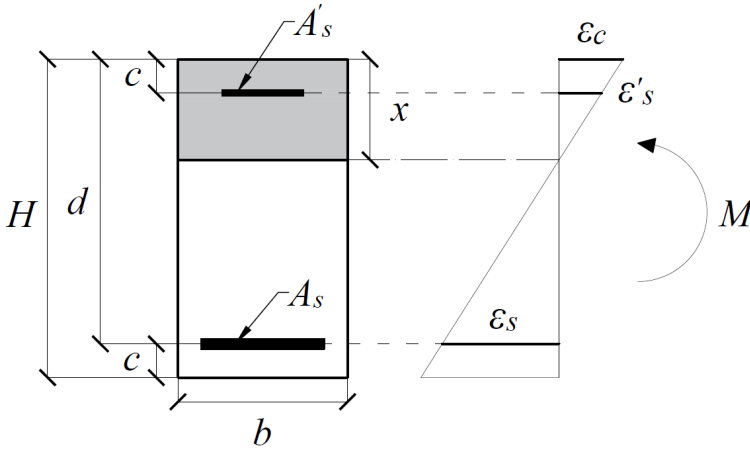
Generic double reinforced concrete beam section in flexure with rectangular compressed zone: Section layout and example of strain distribution
